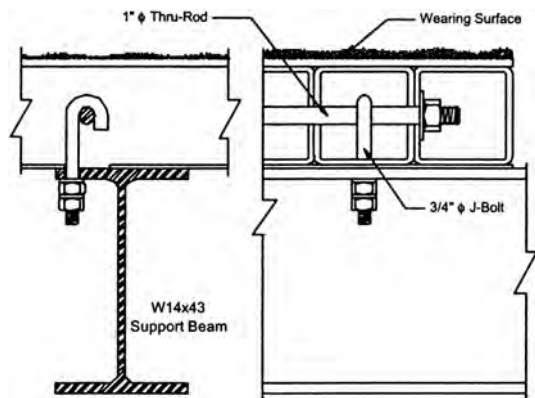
Hook bolt connection between deck and support member [ZCLC01]
